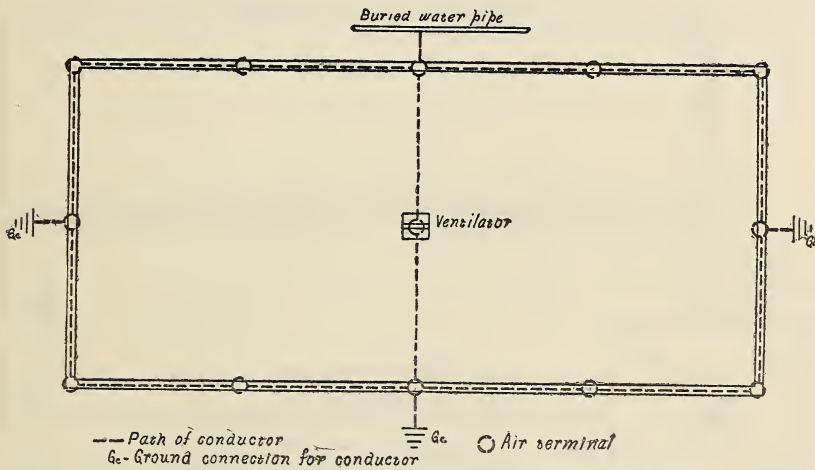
Roof plan of a flat-roofed building, showing installation of lightning rods. Roof surrounded by a parapet
